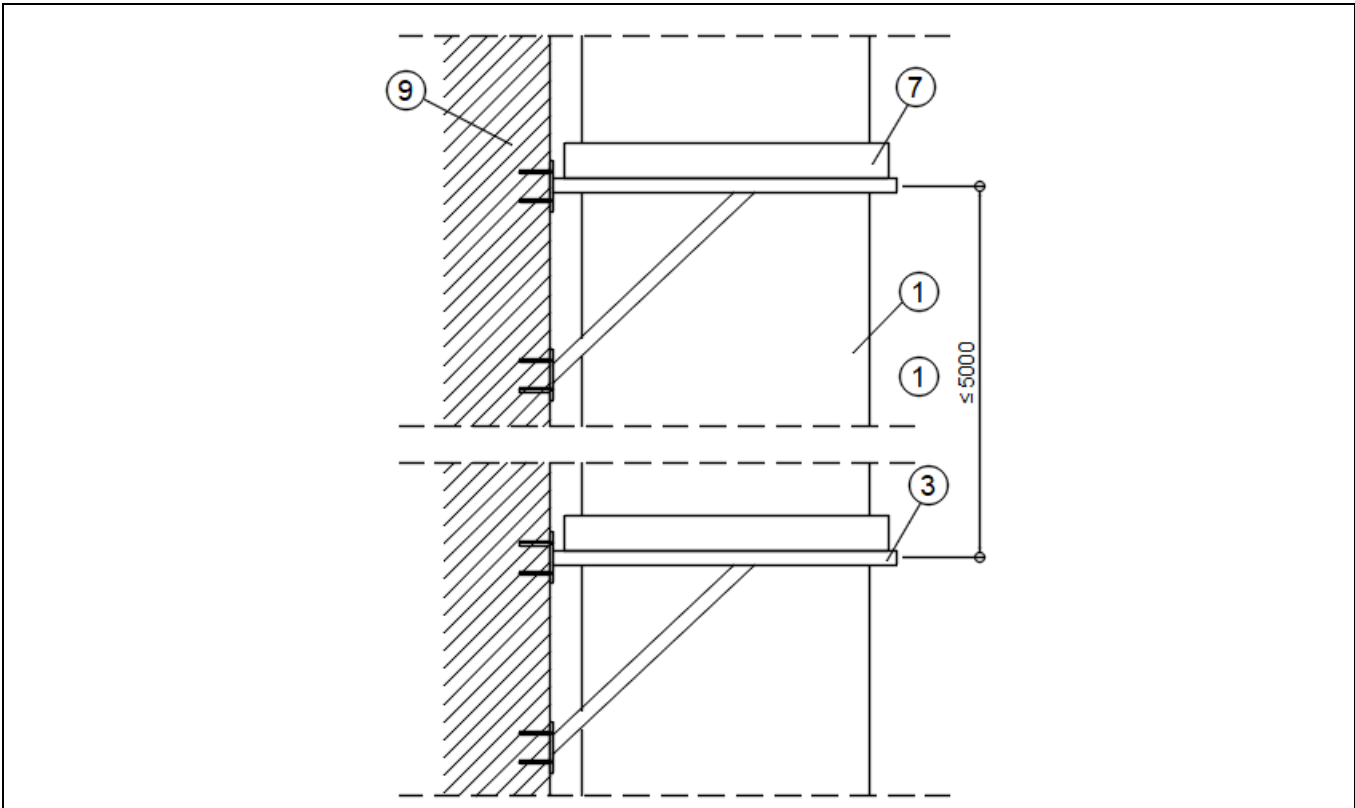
Self-supporting vertical ventilation ducts PROMADUCT®-LT – the method of supporting in the case the distance between floors is longer than 5,0 m
